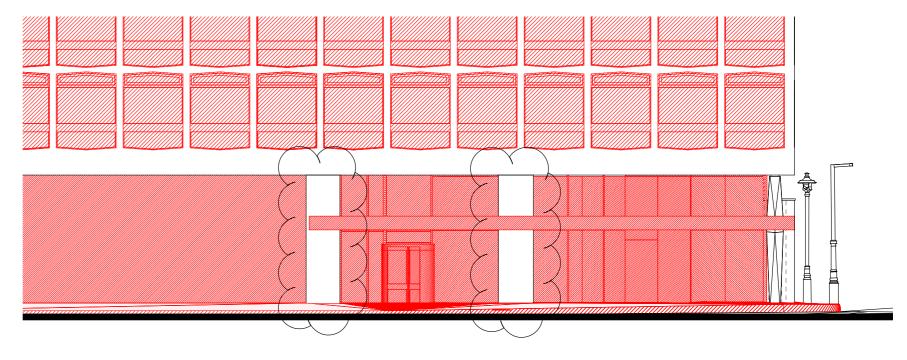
Consented Ground Floor Demoliton Plan - Existing Concrete Piers Location
